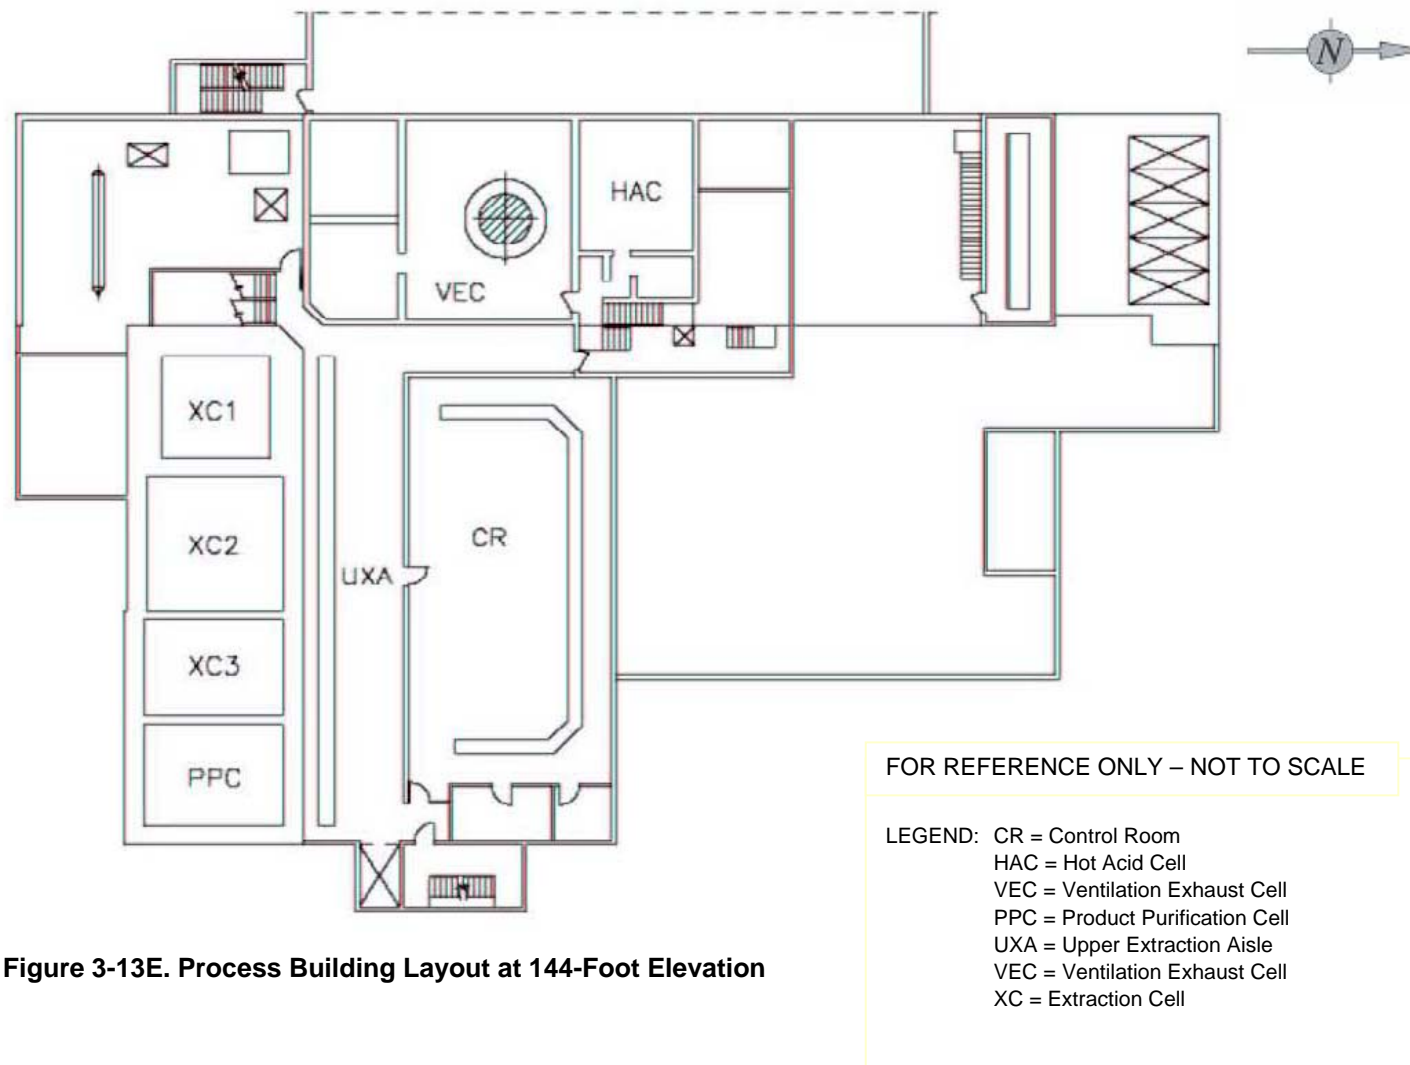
E. Process Building Layout at 144-Foot Elevation
